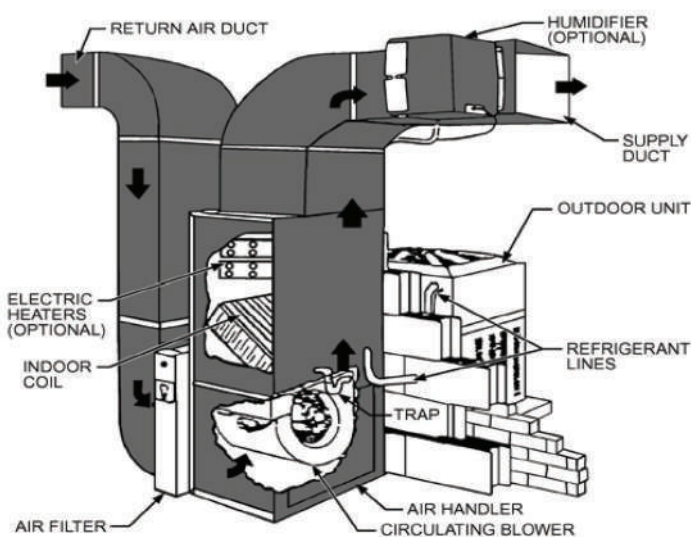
Typical Residential Installation of a Split-System Air-to-Air Heat Pump
